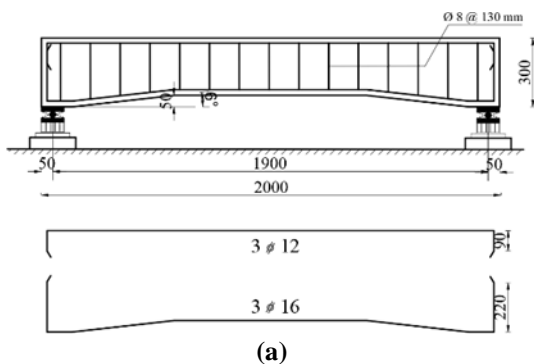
Geometry and reinforcement details of group G2 beams (Dim. in mm)
